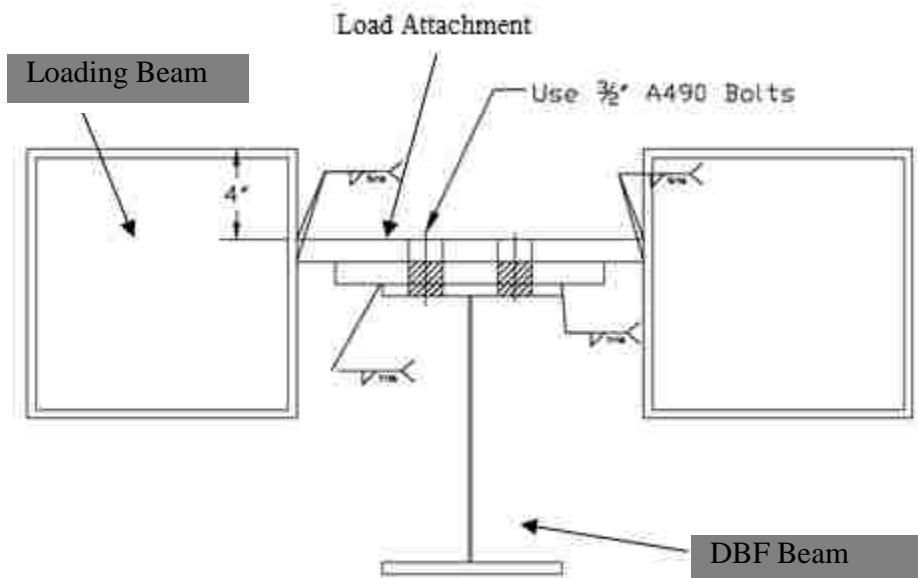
DBF Column Bracing and Loading Beam Shelves (Dong 2013)
